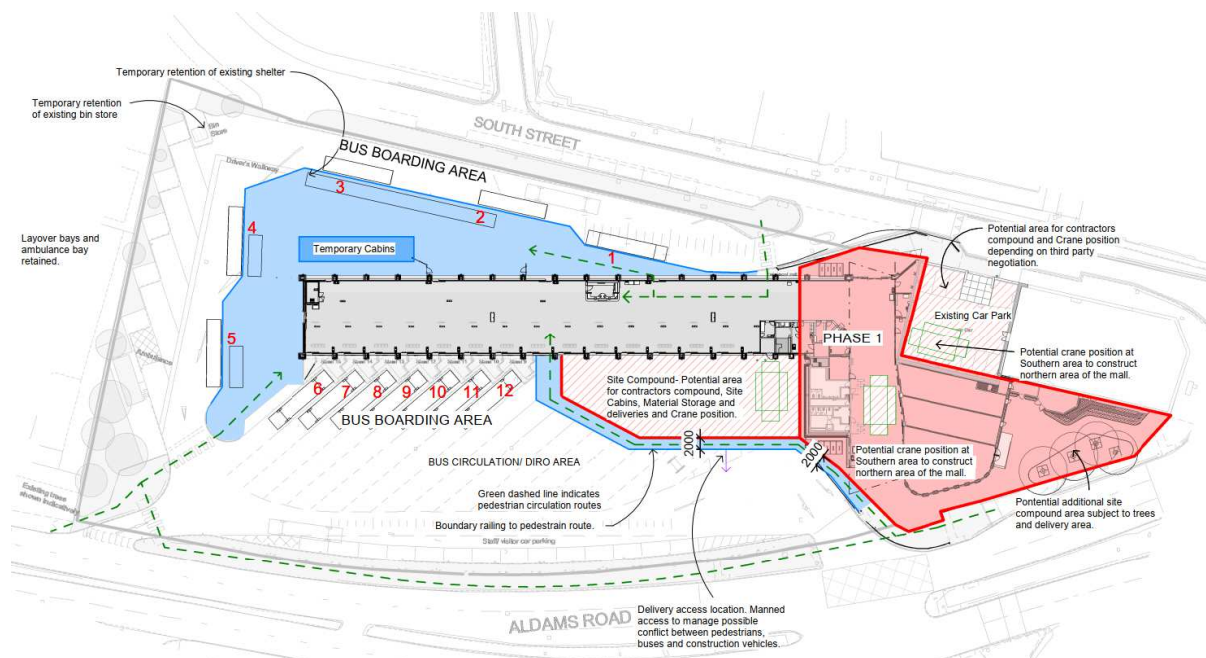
Phase 1 Plan – Temporary Facilities, Retail Units and Mall Construction
